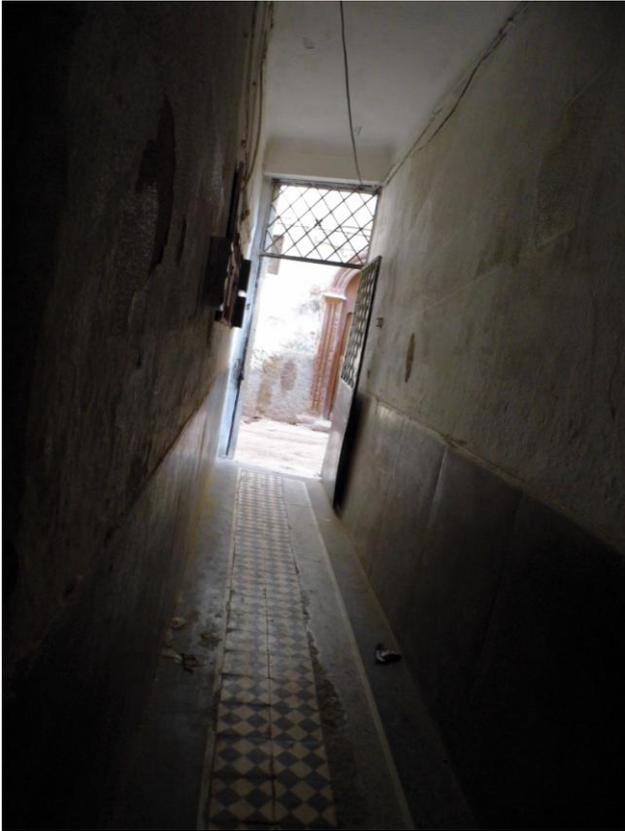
(Upper left corner) The corridor from the stairwell out towards the street.
